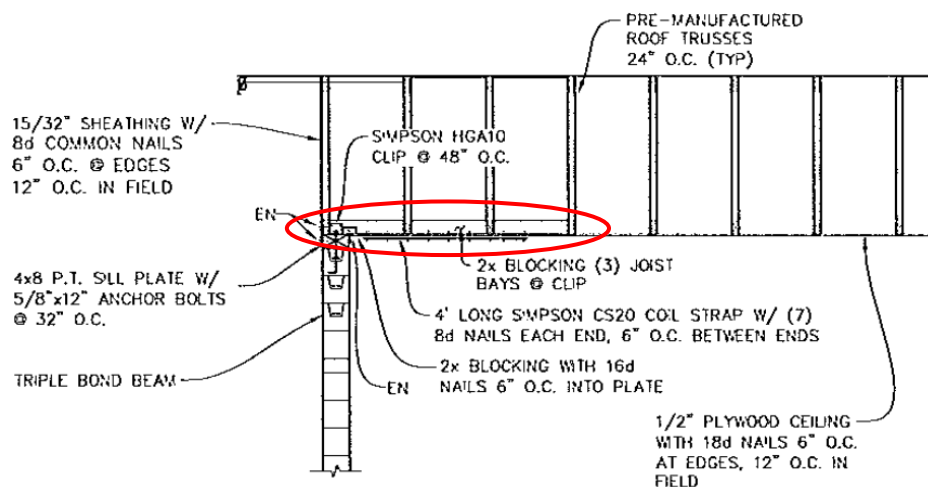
Inadequate Transfer Length between Blocking and Ceiling Diaphragm
